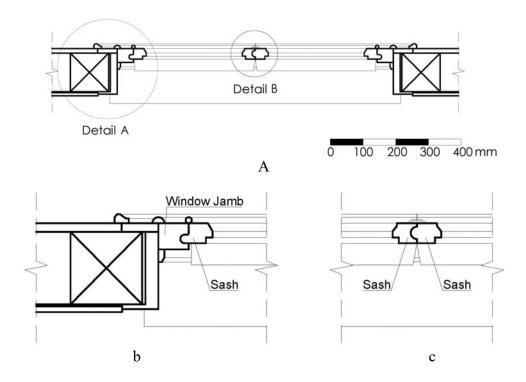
Window plan (a), tongued-grooved joint detail A (b), detail B (c) (Source: Yüksek, 2005, 22)
